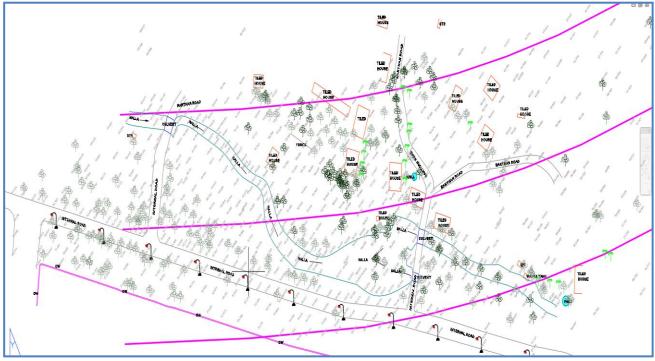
shows the detail drawing showing structure and Trees affected along Goregaon side approach Road.
